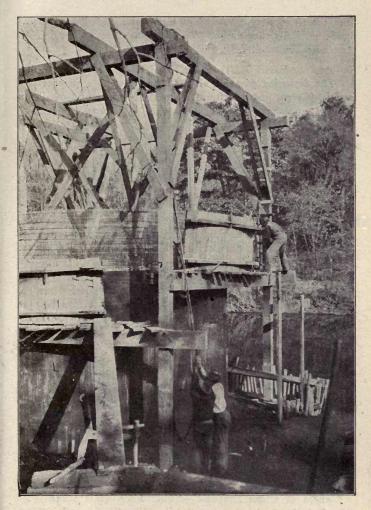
Manner of Raising Forms, Intake Tank, LaSalle, Ill.
